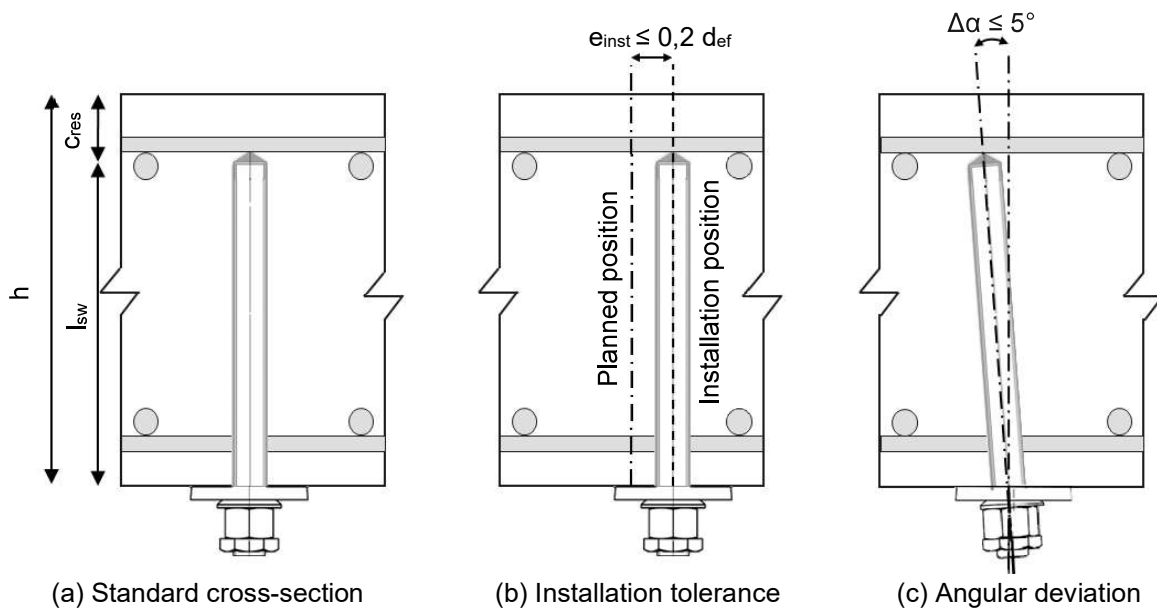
Installation conditions with dimensions and permissible installation tolerances, where:
